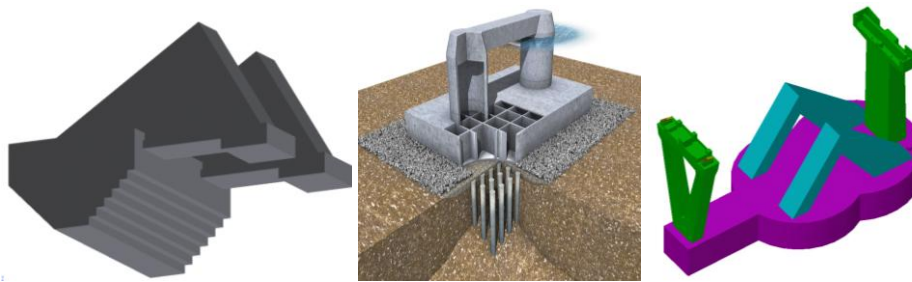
Foundation concepts; (a) North anchor block; (b) Tower foundations; (c) South anchor block
